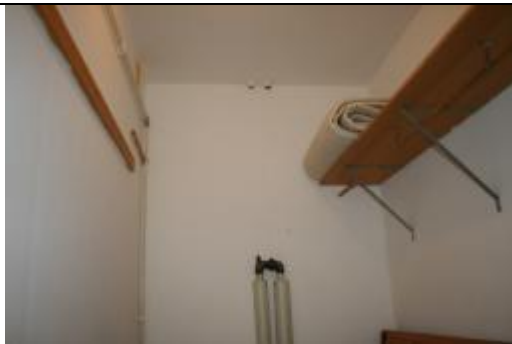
One pipe heating system inside concrete joists is distributed through the clothes cupboard.
